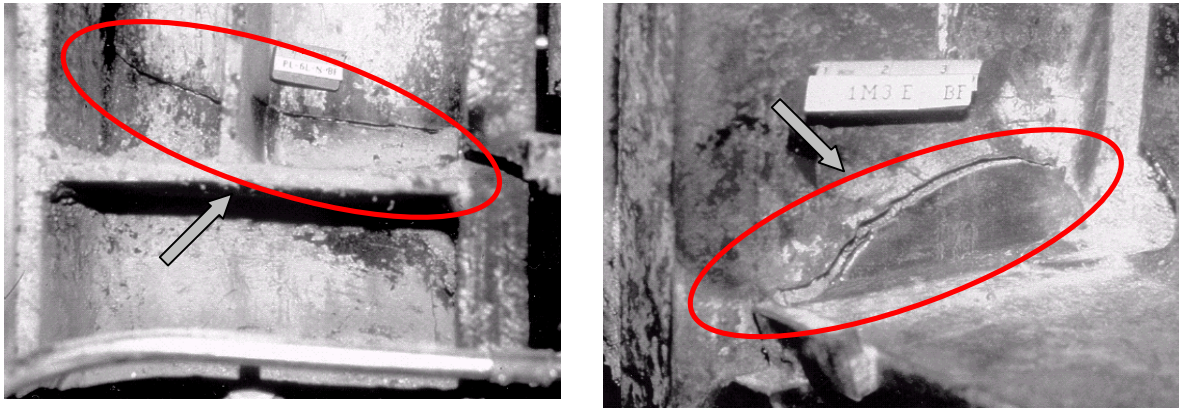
Brittle fracture of beam bottom flanges in welded MRF connection during Northridge earthquake: fracture propagating through column web and flange (*left*) and fracture causing a column divot fracture (*right*) (after Naeim, 2001).
